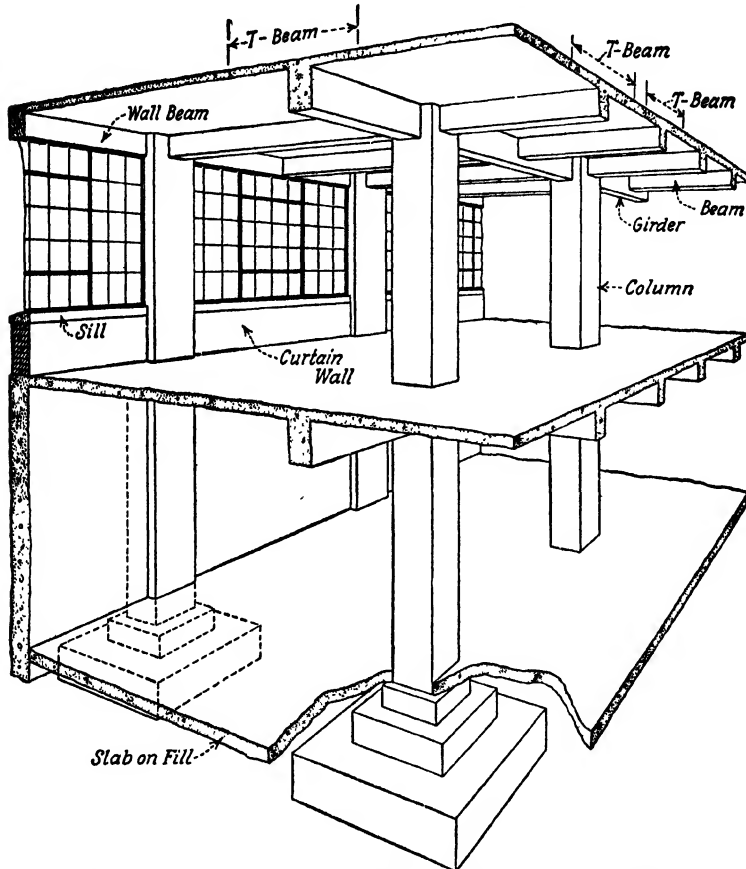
Perspective View of Beam and Girder Skeleton. (See p. 574.)
